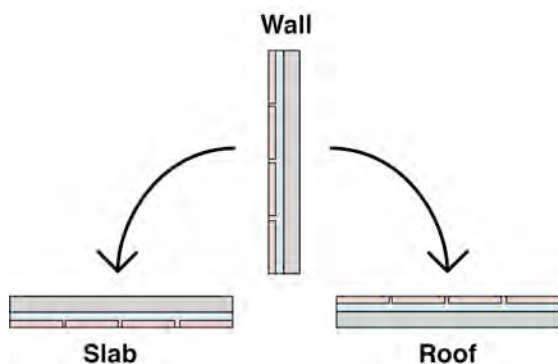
Walls Are Roofs Are Walls—The same approaches can be applied to both walls and roofs – the argument being that similar loads and the same laws of physics apply.
